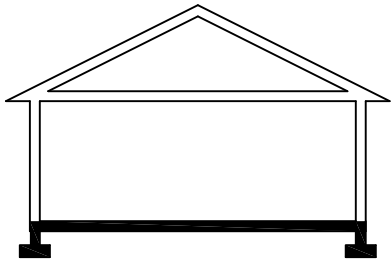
ROOF AND CEILING OVER SLAB-ON-GRADE
